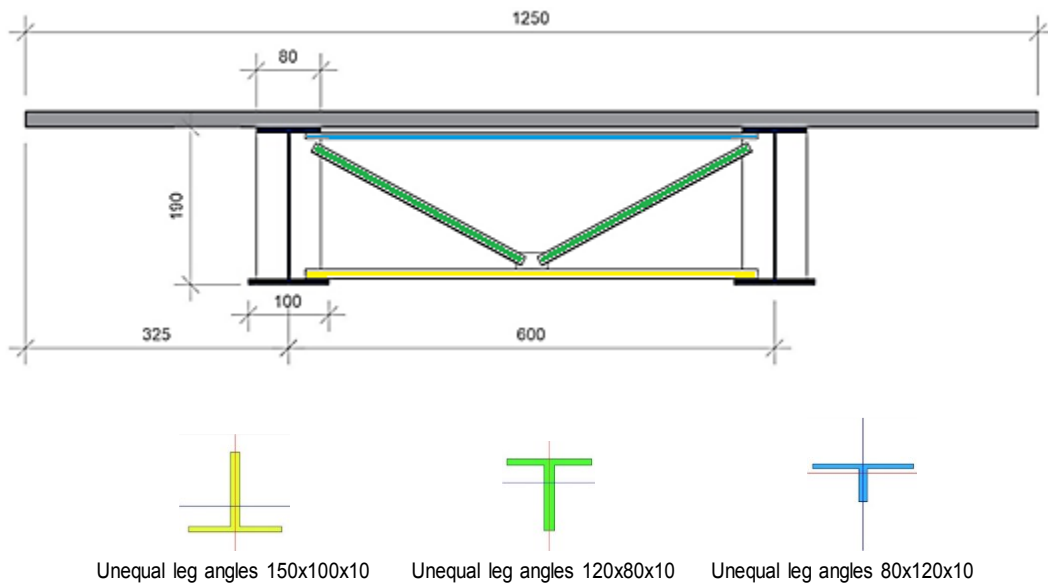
Cross sections of the beams constituting the truss end cross beams.
